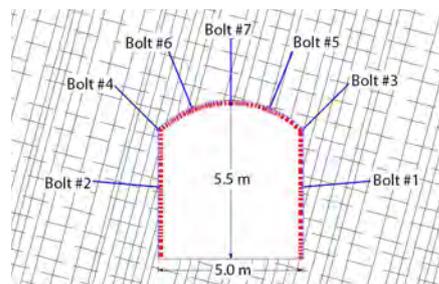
5 x 5.5 m arched tunnel in jointed rock mass, supported by rockbolts (Split-Sets) and liner (shotcrete)
